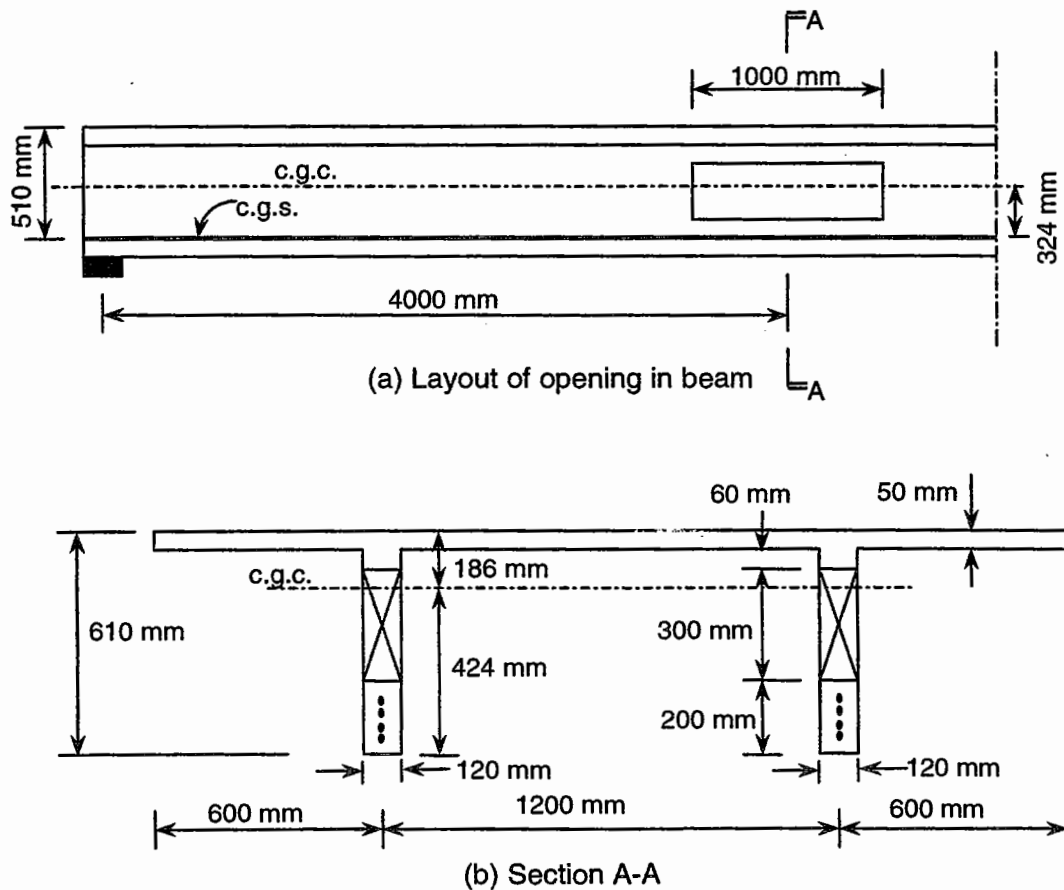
Precast prestensioned double-T beam with opening.
